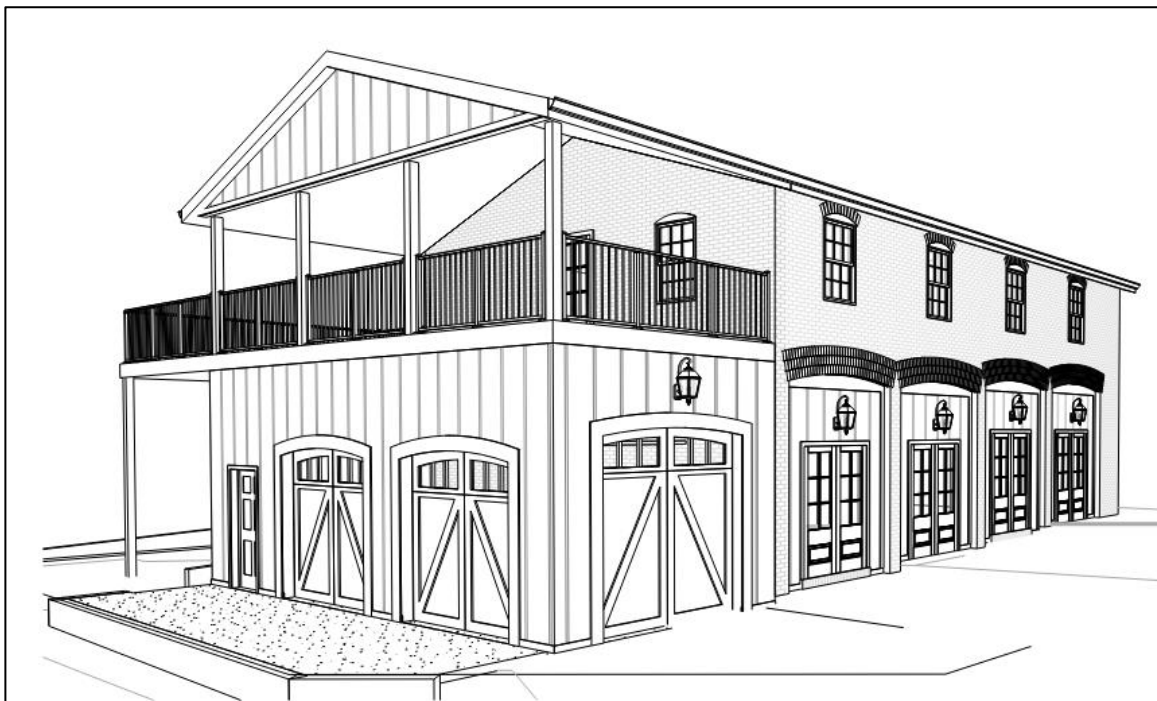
Rendering of proposed new doors on the Perry Street façade.
